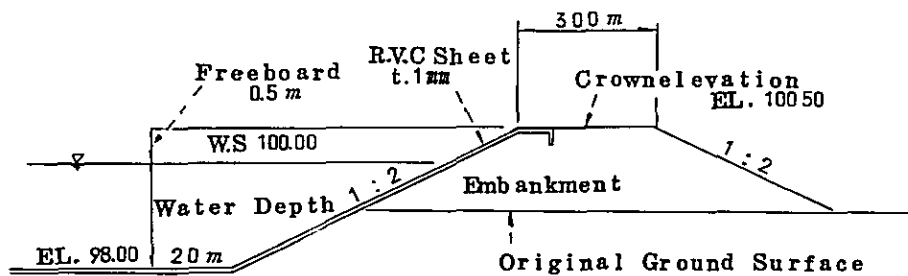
Cross Section of Farm Pond Embankment
